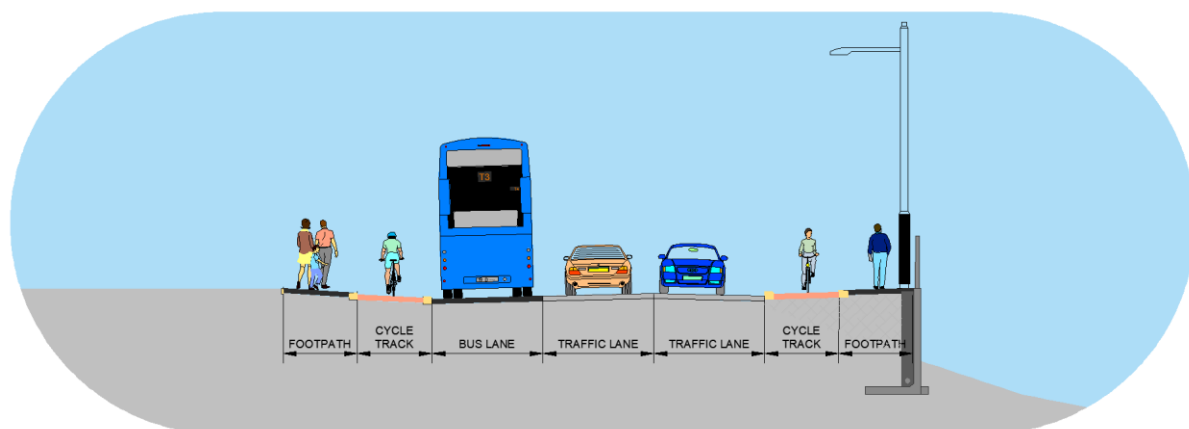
Typical CBC Cross Section Greenhills Road East of Calmount Road Tie-In
